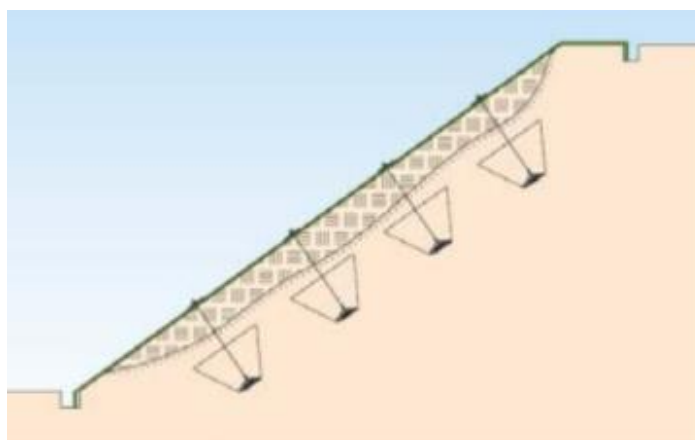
Surficial slope failure stabilization by earth anchoring (flip anchor) systems (Titi & Helwany, 2007).
